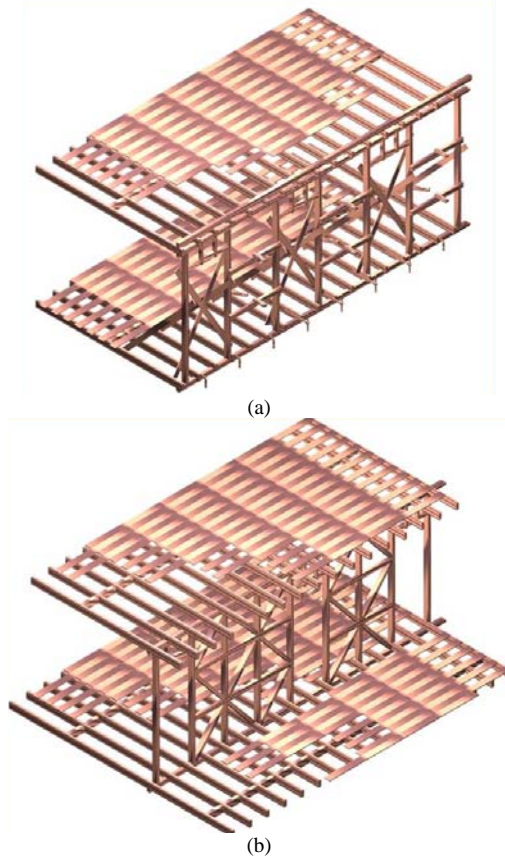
Load-bearing structure: (a) external cage walls; and (b) internal walls
